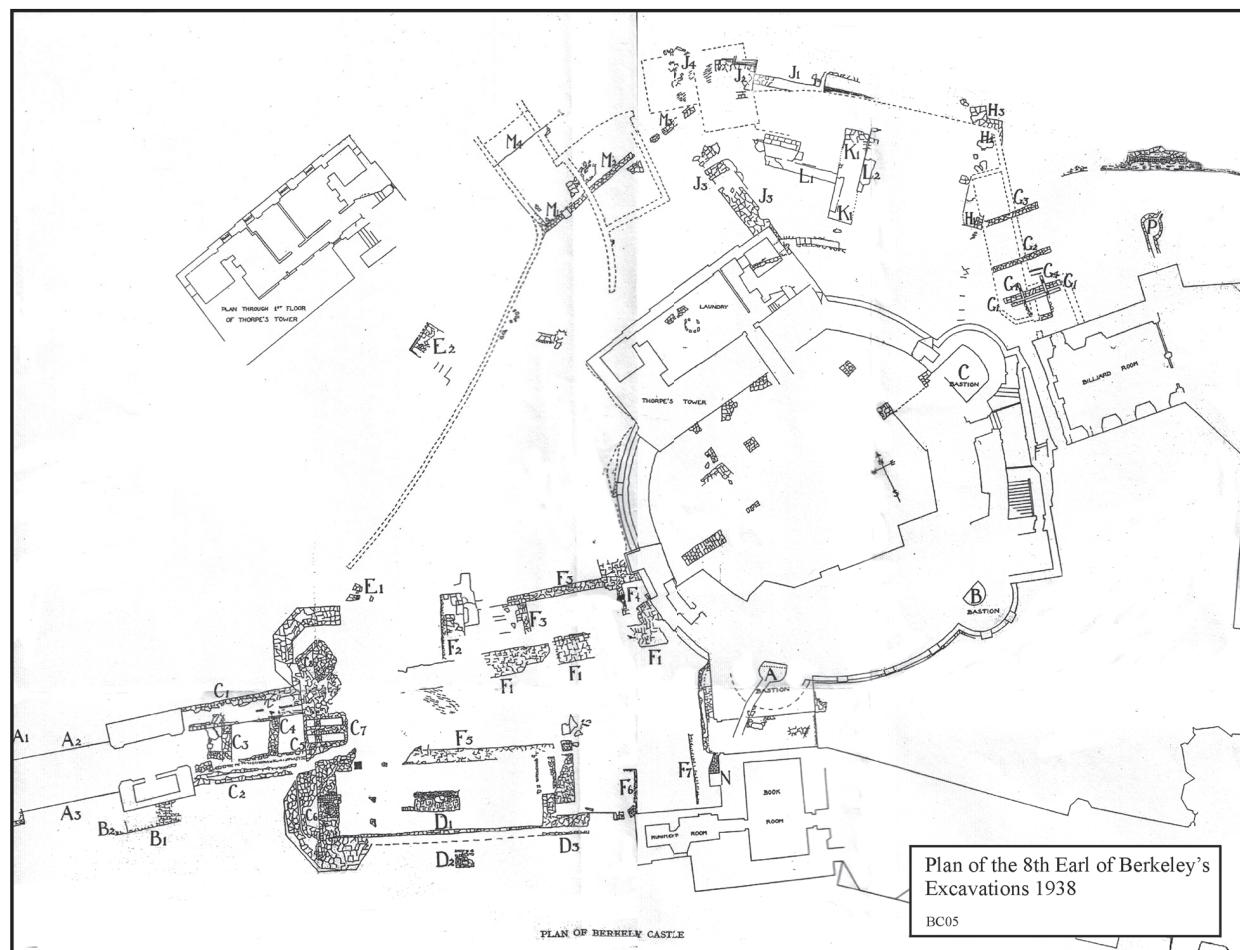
Plan of the 8th Earl Berkeley excavations in 1938
